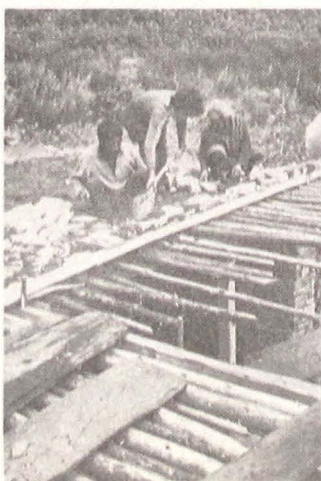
Construction of the roof    Fig. 34 — Building of the roof edge
